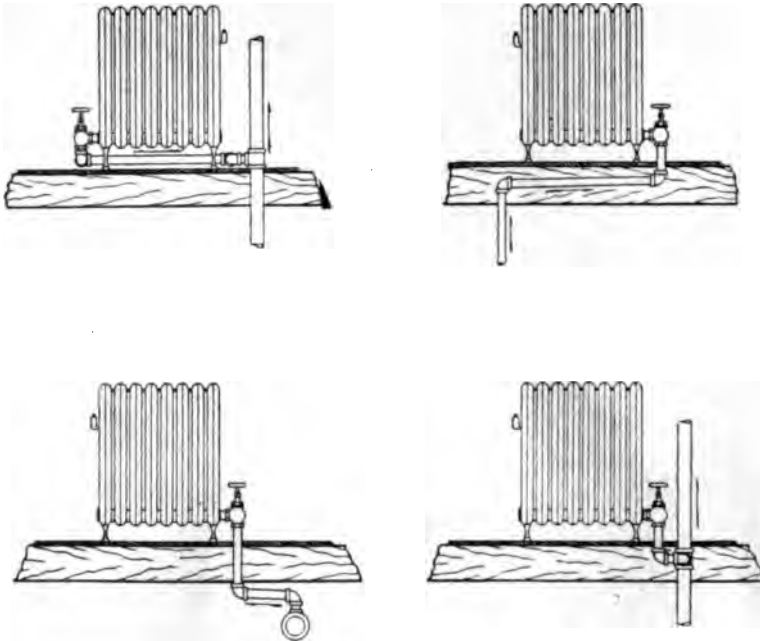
Methods of Connecting Steam Radiators, One-Pipe.
